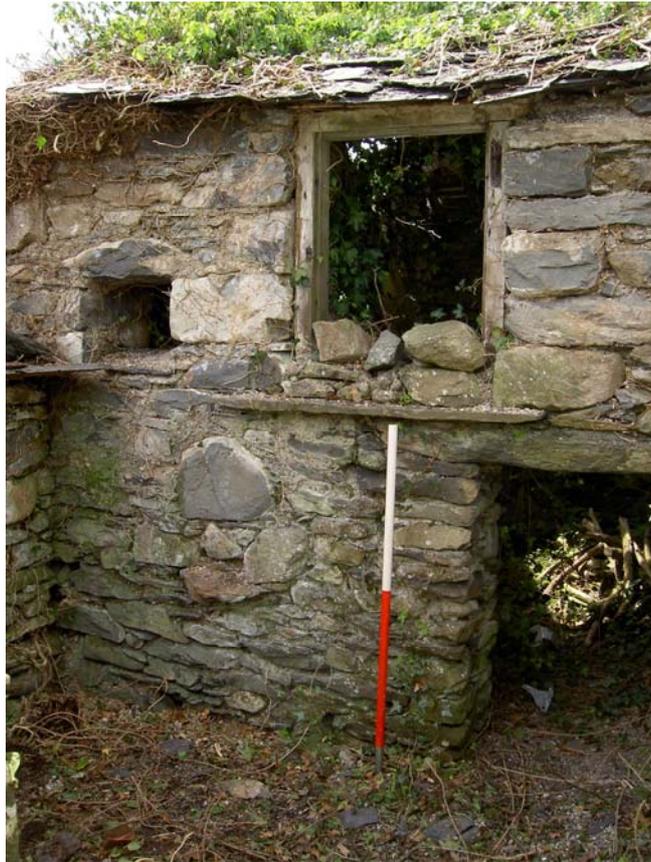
Detail of the apertures in the southern side of the east external elevation of the pigsty, facing west (film refs. 1_9/2+3_5-6)
